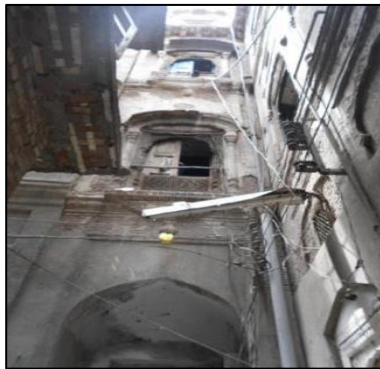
Elevation of House No. D/749 (Source: Authors)
